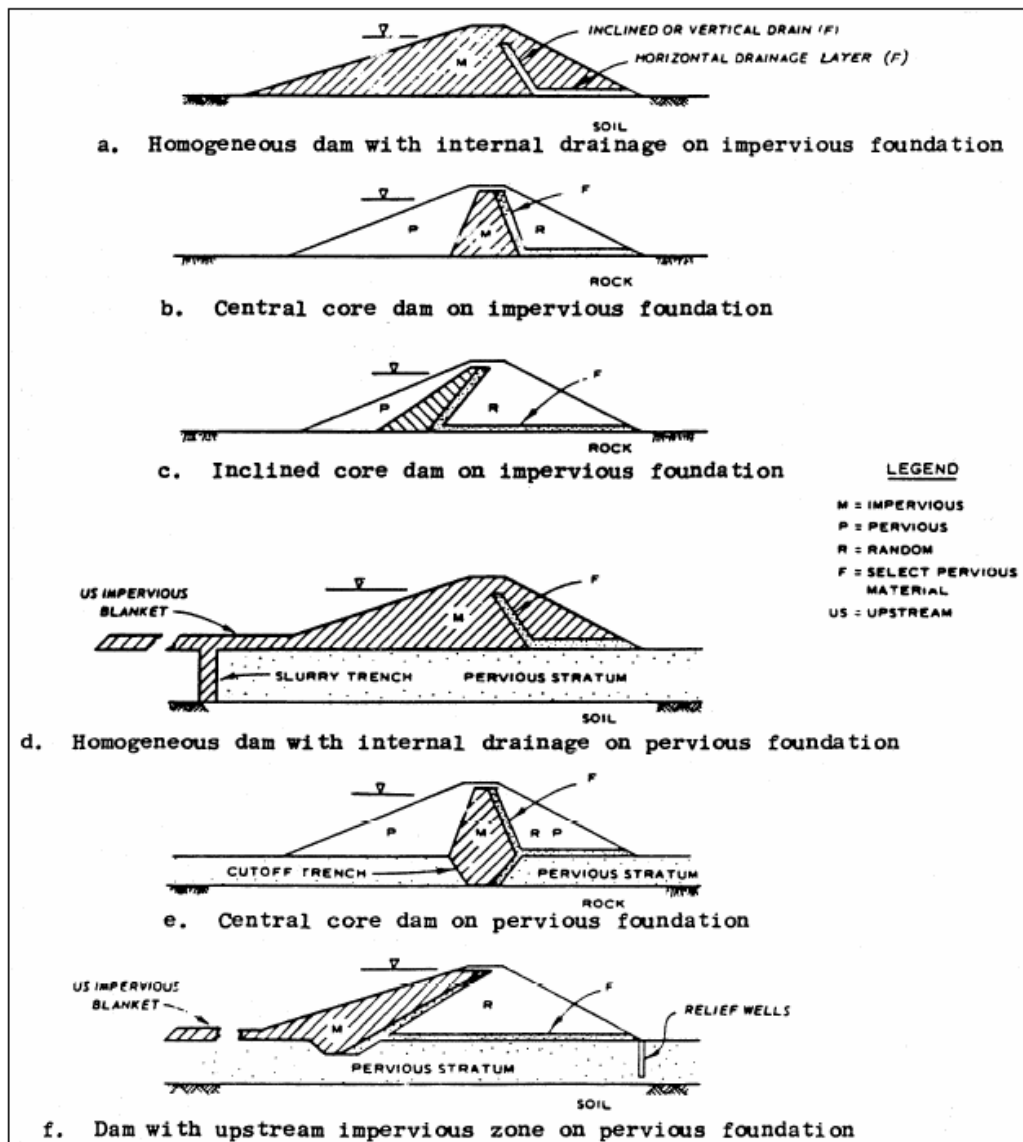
Typical cross sections of earth-fill dams (www.theconstructor.org)
